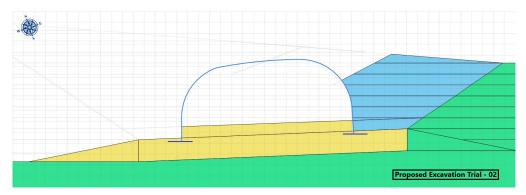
Plan view - Proposed Excavation - Trial 02
